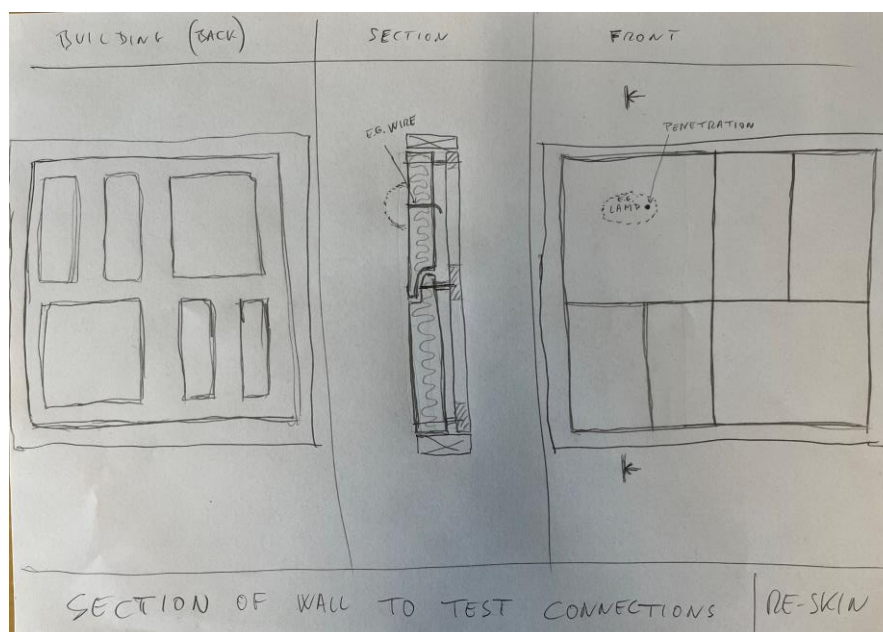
Example of construction of test specimen including several connections, joints and penetrations.
